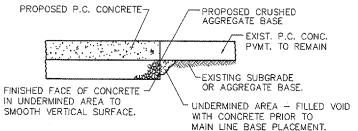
JOINT TYPE-D,E,F & H
